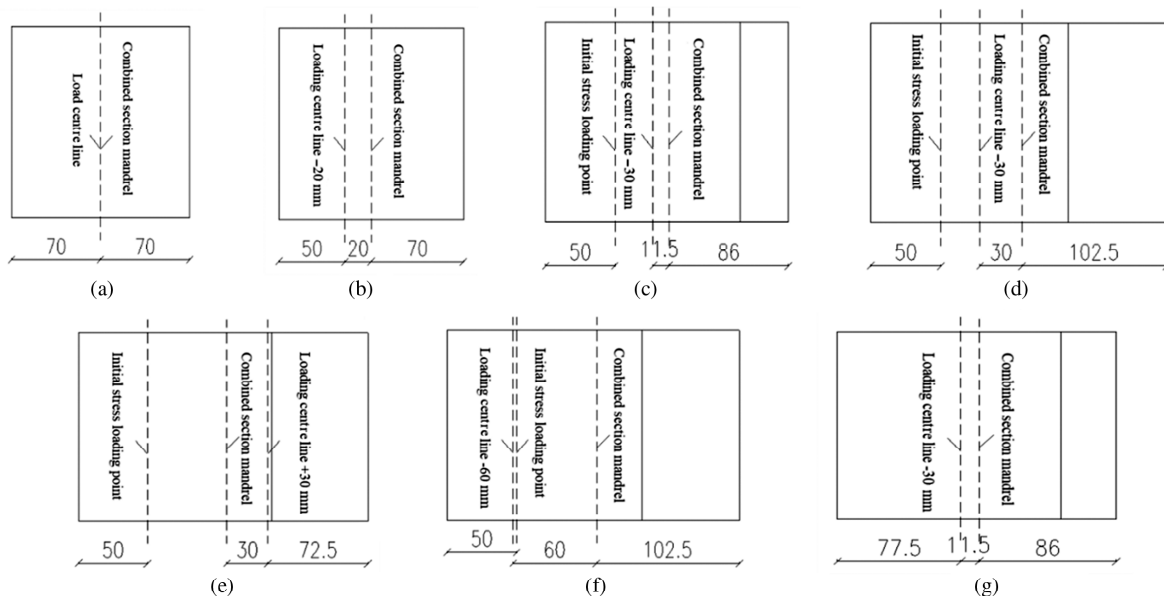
Loading position diagram: (a) specimen A; (b) specimen B; (c) specimen I; (d) specimen C, D, and F; (e) specimen E; (f) specimen G; and (g) specimen H.
